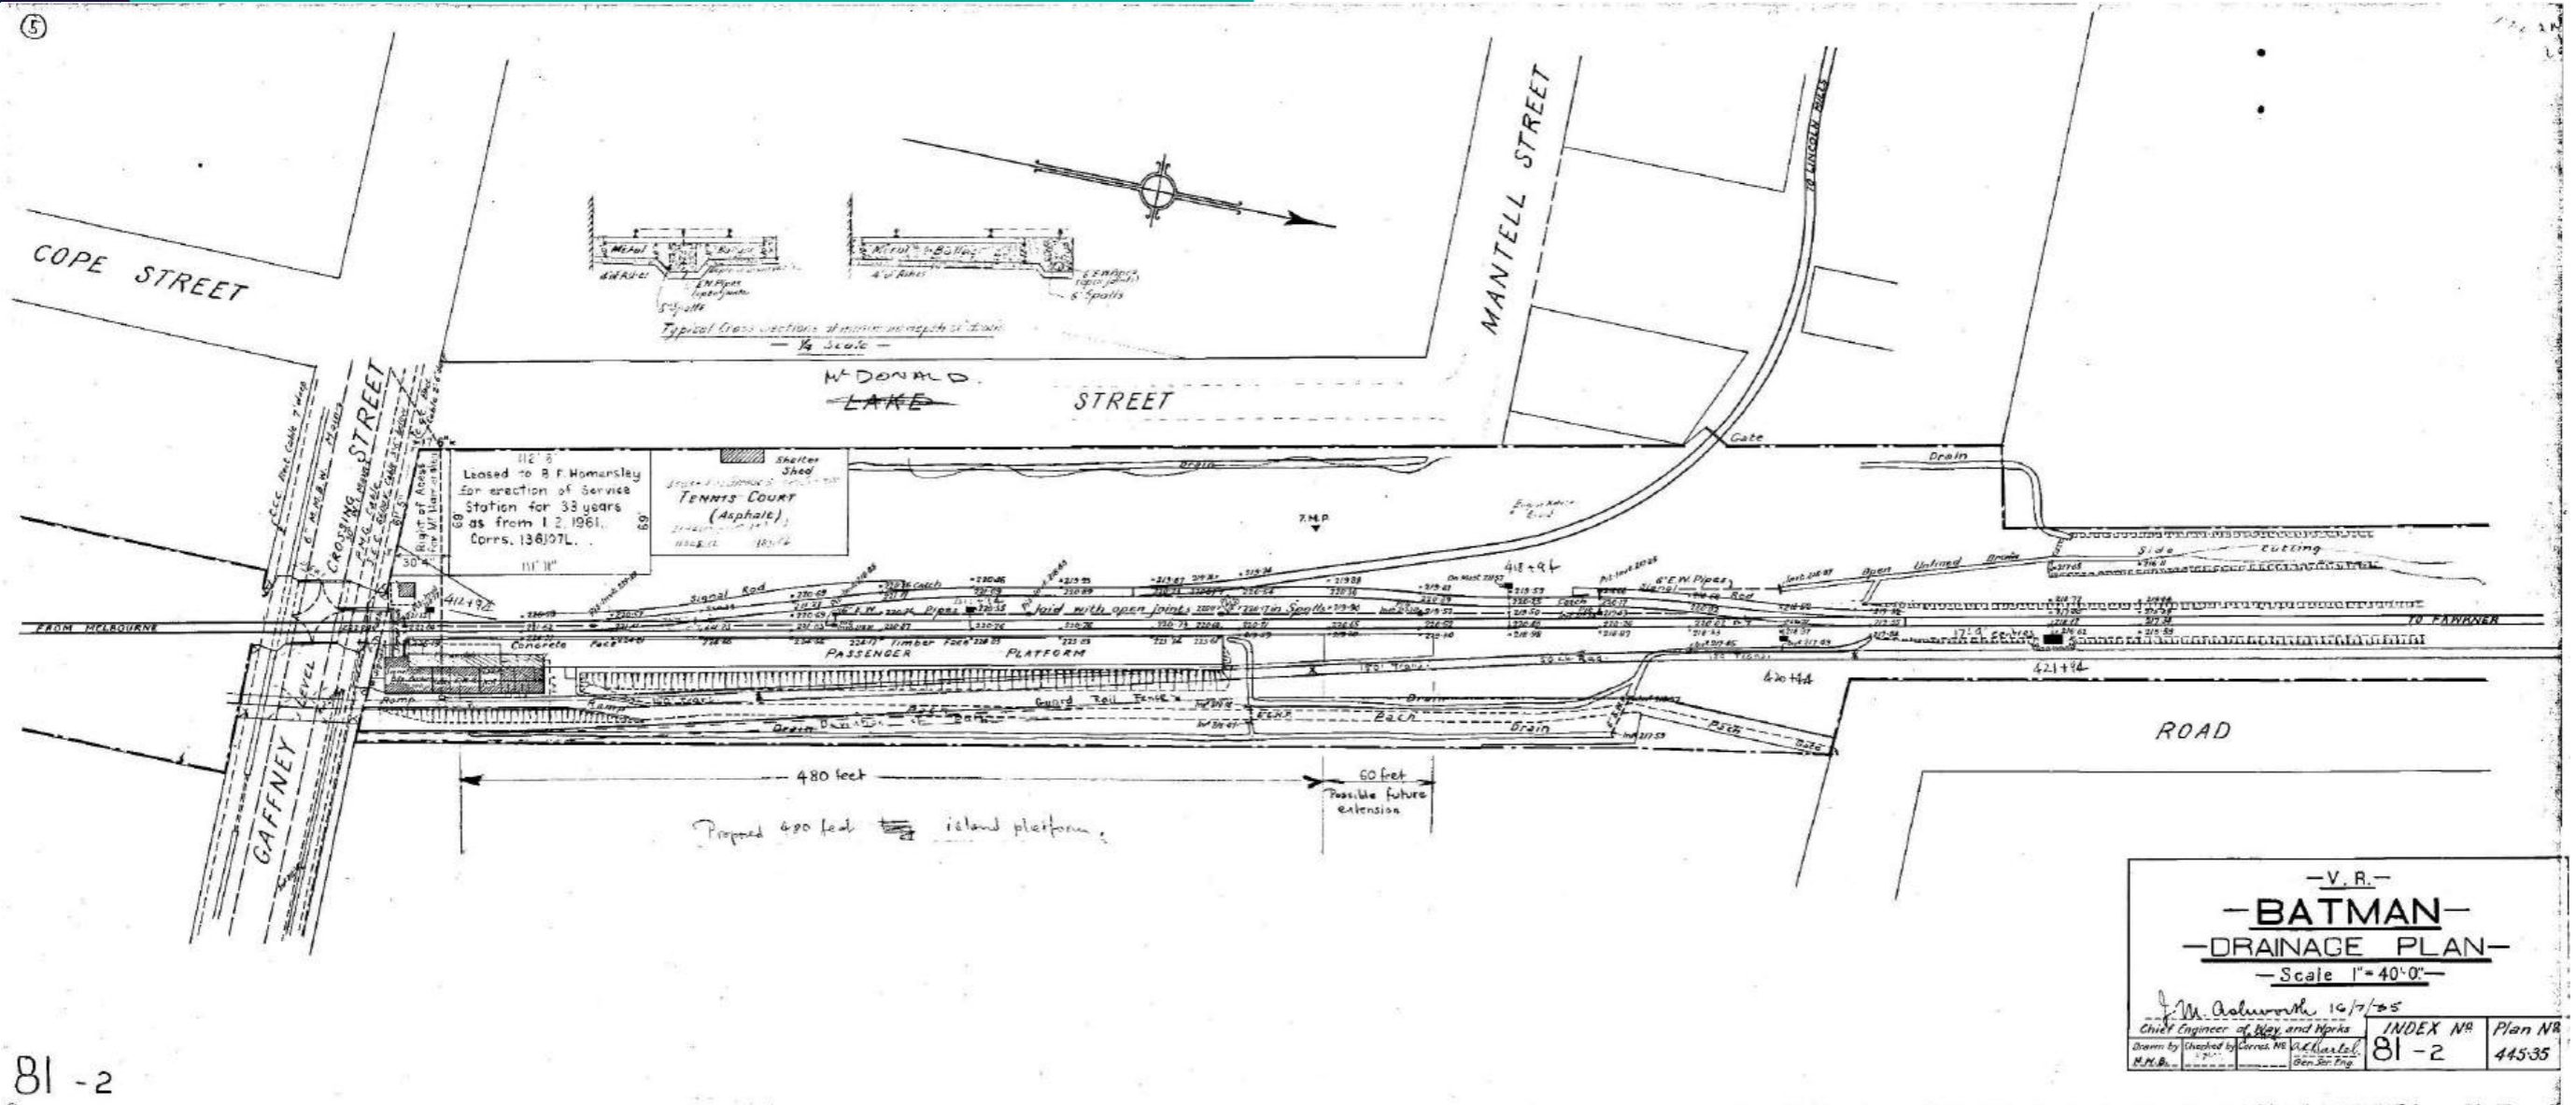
1935 detail plan showing drainage works at Gaffney Street and displaying location of gatekeepers cabin and rail sidings extending northward. (Public transport Victoria Drawing Management System. 10/06/2020).
